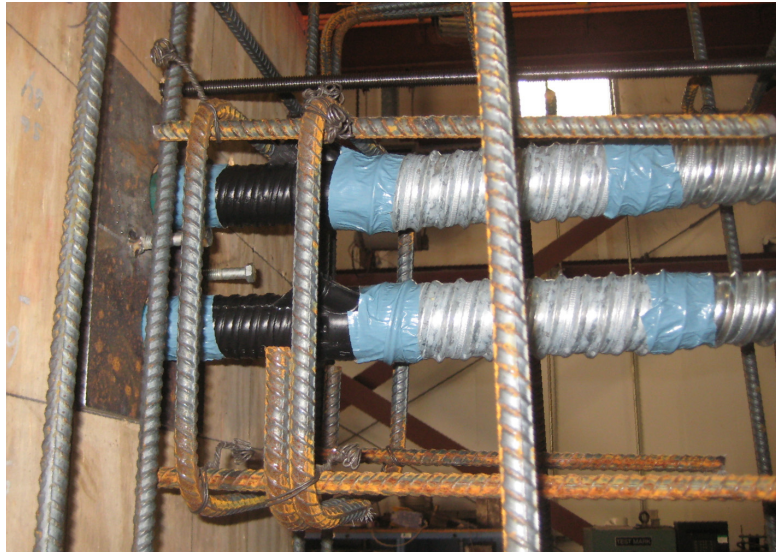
Open end block formwork revealing mild reinforcement and lifting loops:
